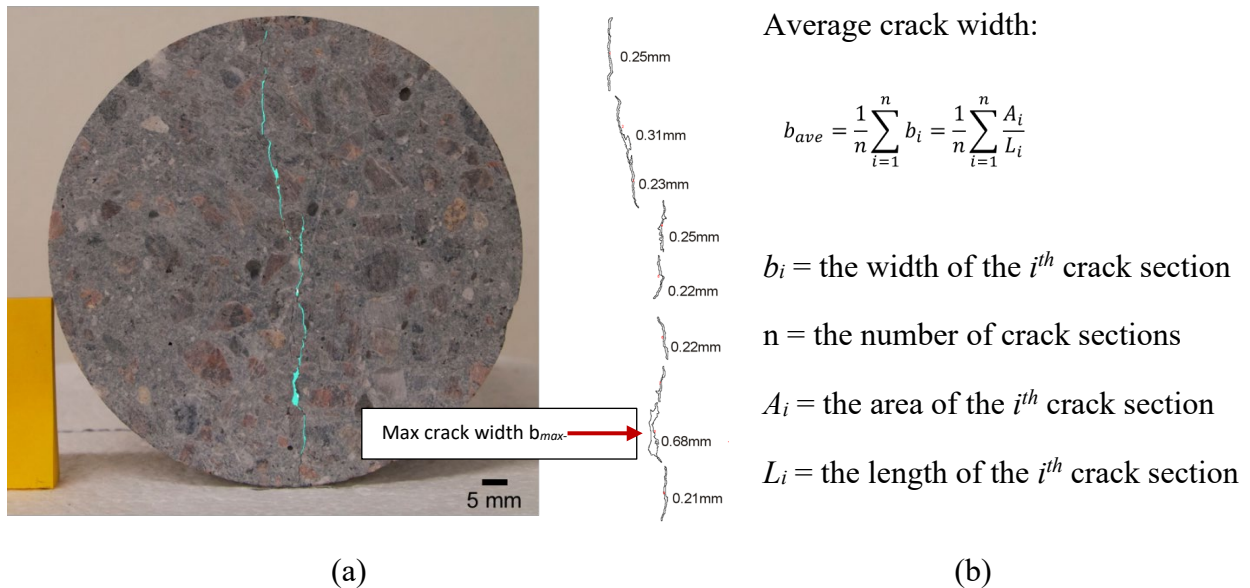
(a) Crack pattern and (b) measurement of crack width for one disk specimen.
